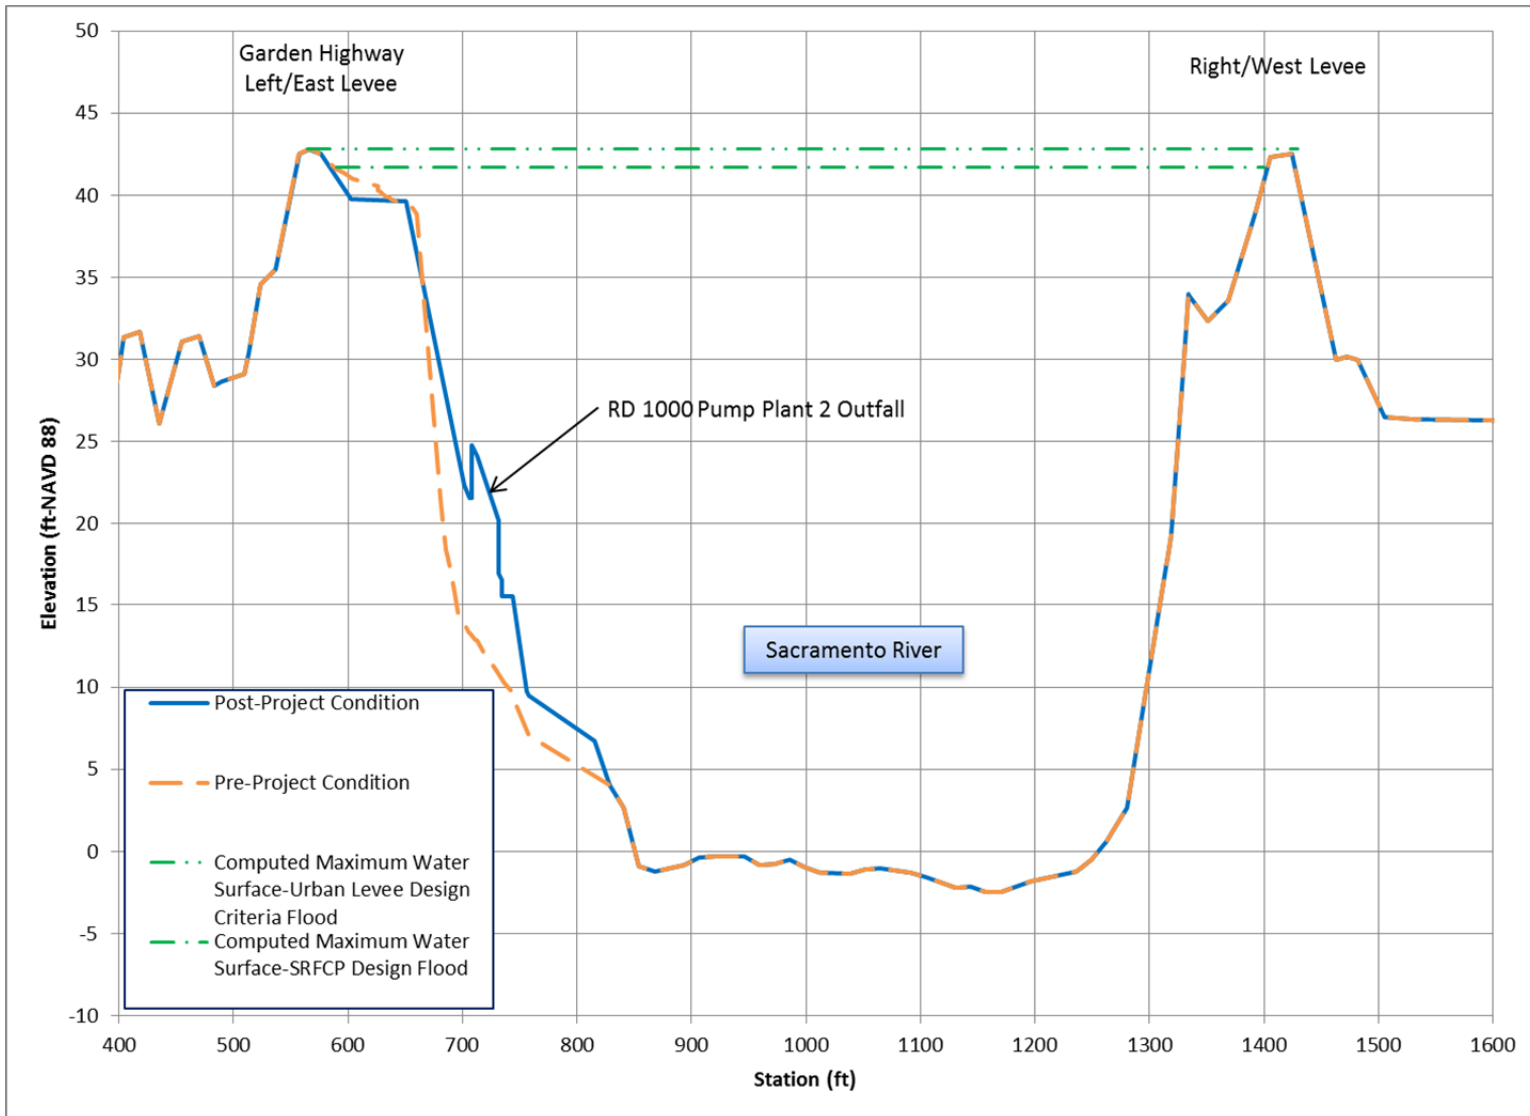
Pre-Project and Post-Project Cross-Section at RD 1000 Pump Plant 2 Outfall (looking downstream)
